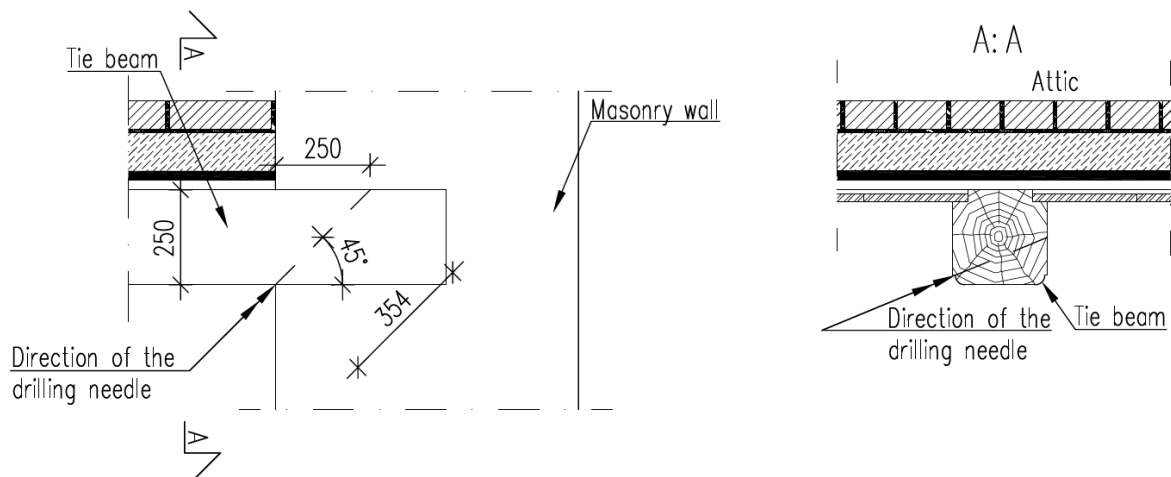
Schematic drawing how the resistance drilling was performed to the tie beams in the third floor. The rafter and the post connect to the tie beam inside the masonry wall even though it is not presented in this figure.
